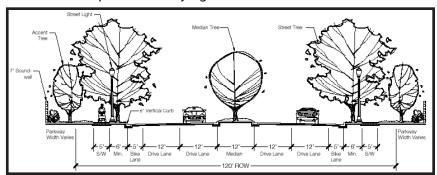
Major Residential Collector Street - Woodbridge by Del Webb, Section L
